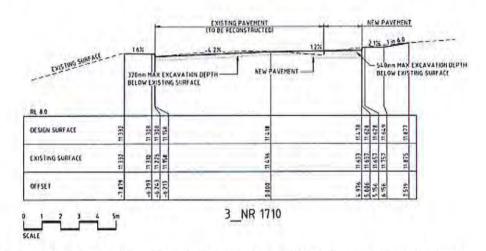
Civil Works Cross Section at 3\_NR 1710, Nobby's Road south of the round-about.
